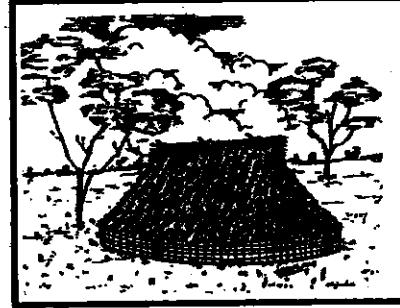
Reconstruction of a 3,500 years old dwelling in Real Alto, in which walls of bamboo boards plastered with clay (as shown below) were found.
